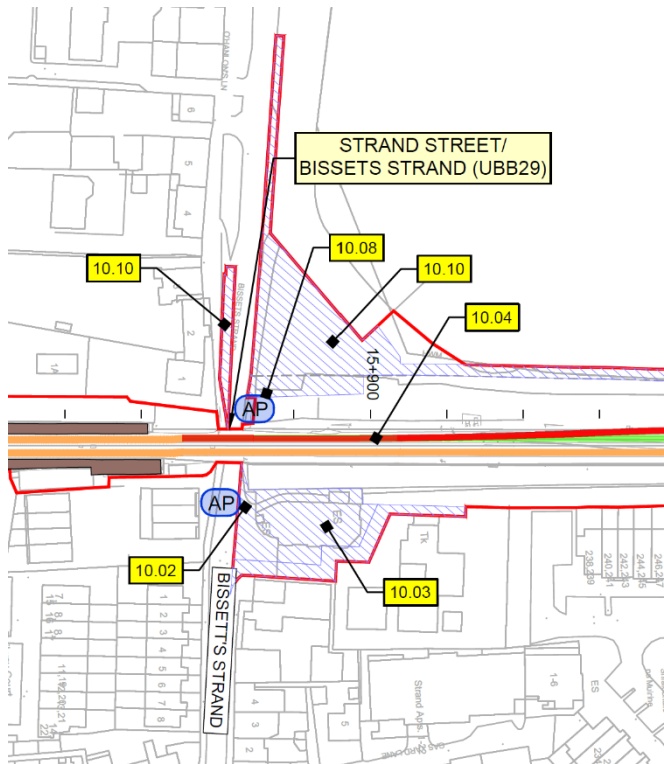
Figure 1: Extract from Works Layout Plan No. 10 Malahide Station and Surrounds from SB0154
